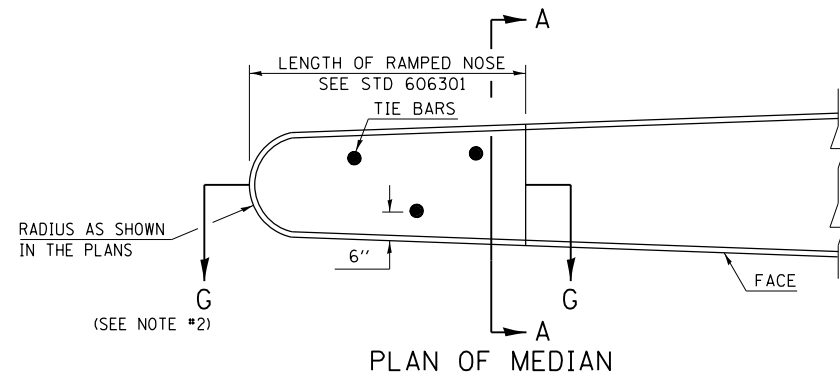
DETAIL OF CONCRETE MEDIAN, TYPE SB-6.06 (DOWELLED)
